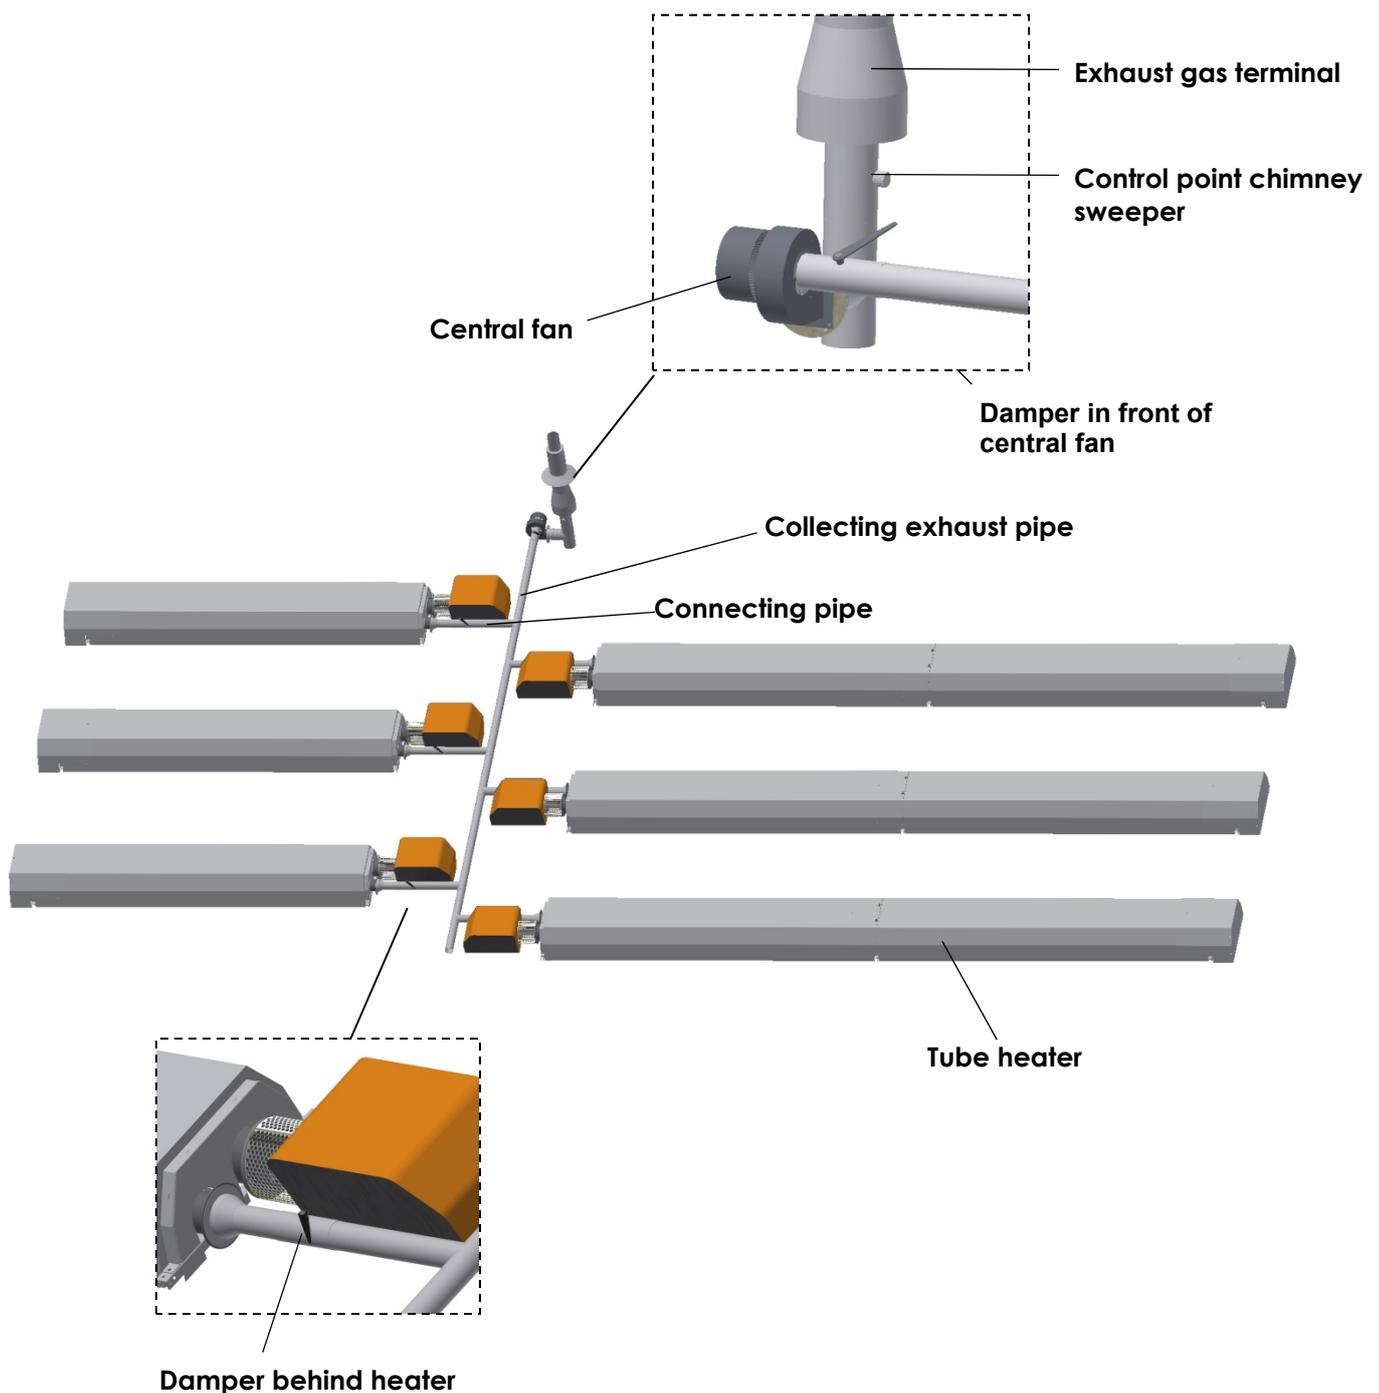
Installation exhaust collecting system with central fan , system F [principle scheme]
